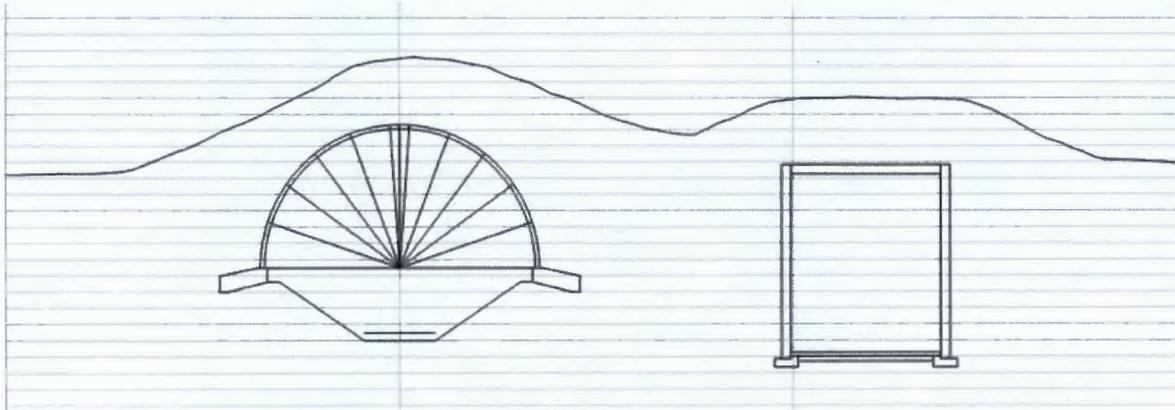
Cross Section at STA 4+00 showing geometry of Tunnel 1, Tunnel 2, and Tunnel Cover Soils
